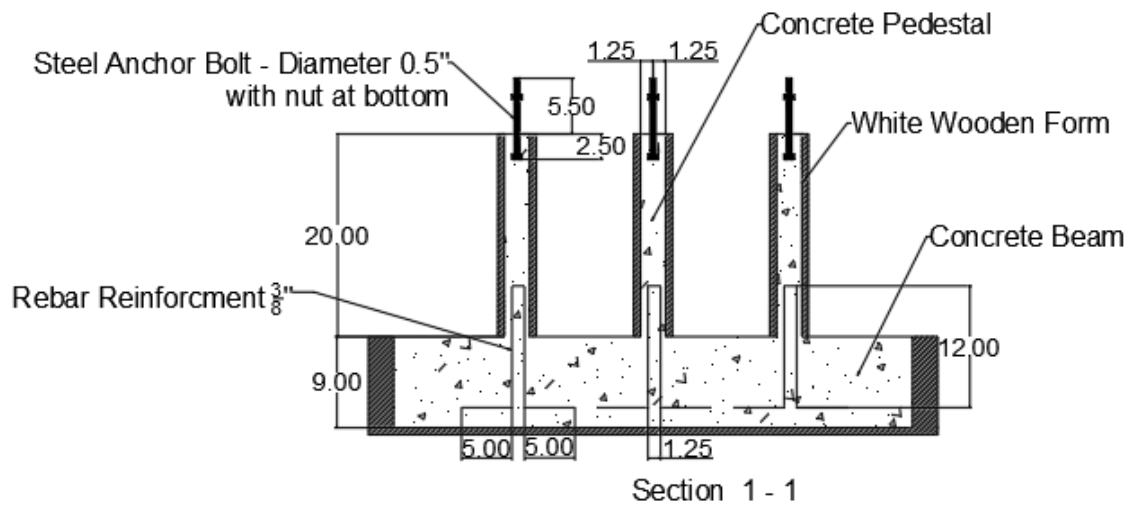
Specimen Sections (1-1), all dimensions in inch.
